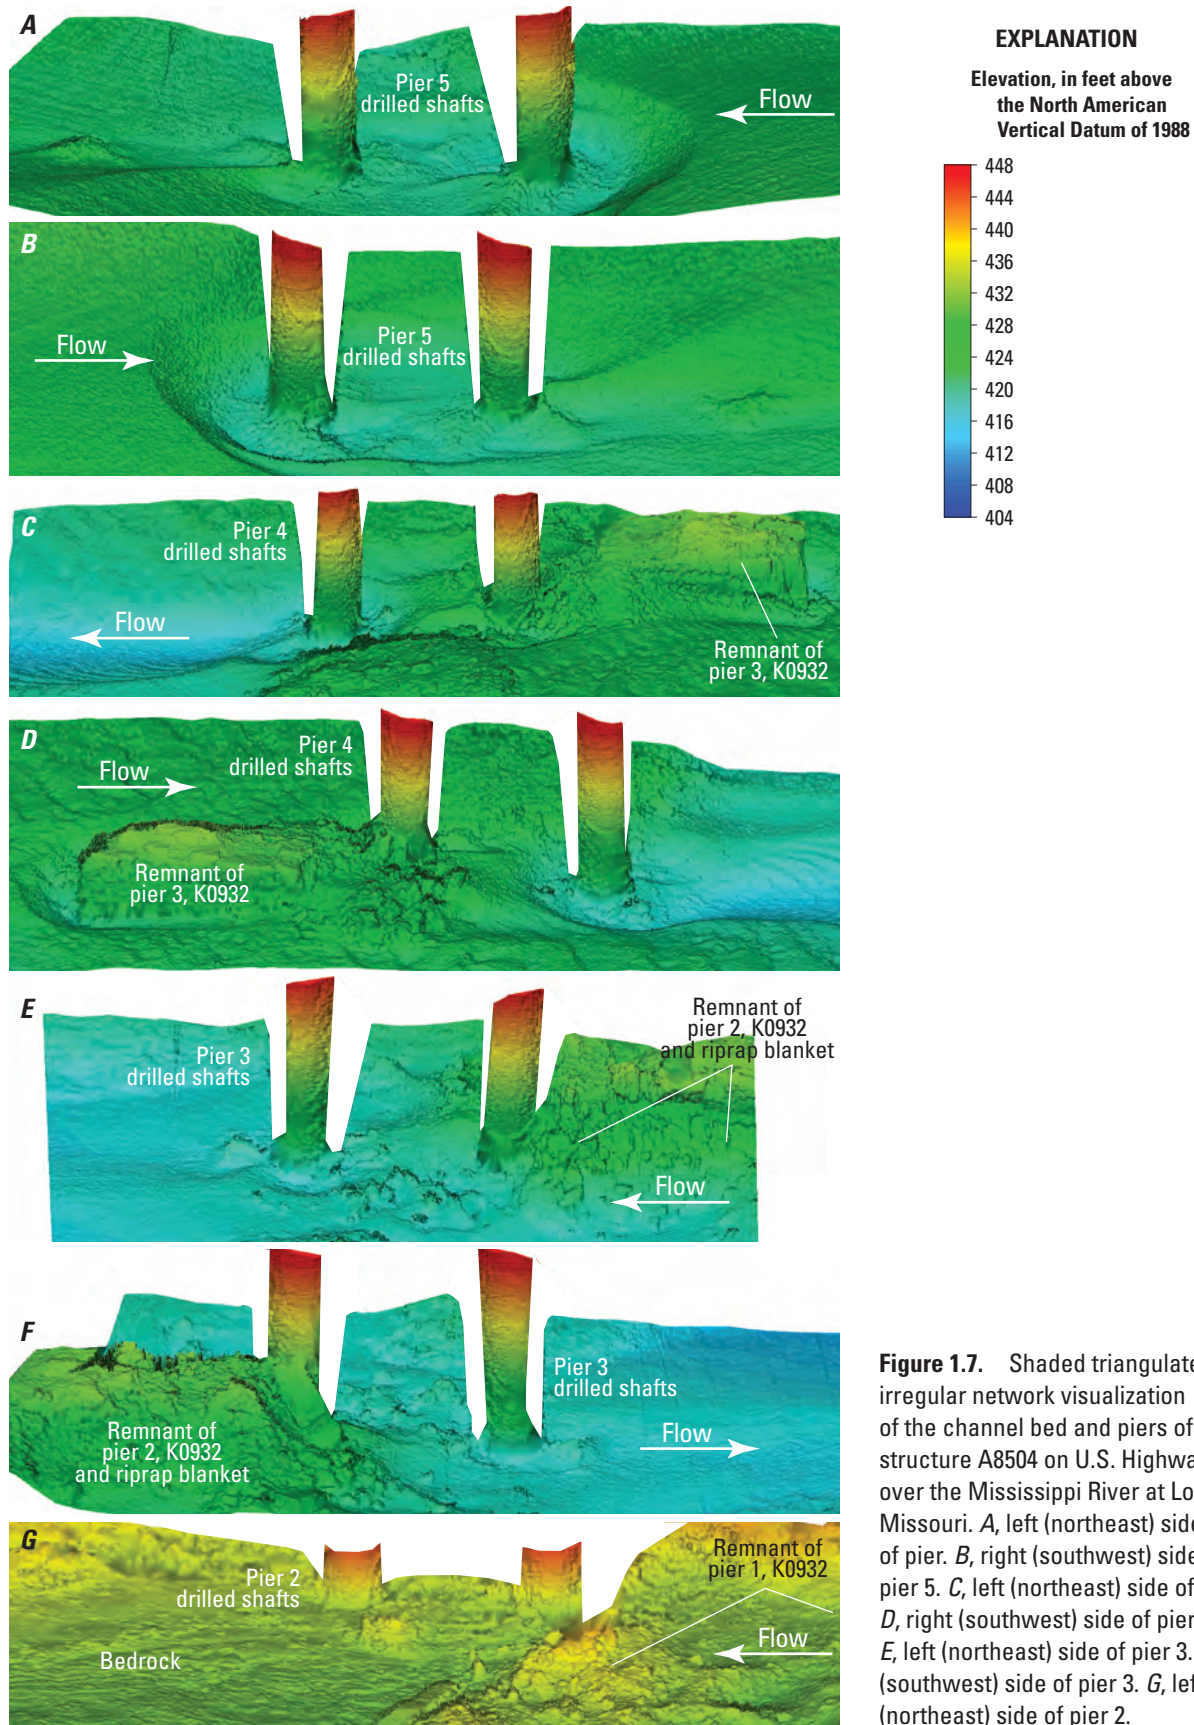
Shaded triangulated irregular network visualization of the channel bed and piers of structure A8504 on U.S. Highway 54 over the Mississippi River at Louisiana, Missouri. *A*, left (northeast) side of pier. *B*, right (southwest) side of pier 5. *C*, left (northeast) side of pier 4. *D*, right (southwest) side of pier 4. *E*, left (northeast) side of pier 3. *F*, right (southwest) side of pier 3. *G*, left (northeast) side of pier 2.
